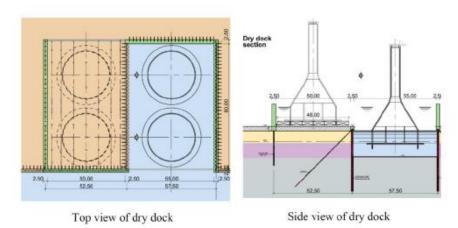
Plan and side elevation view of launch methodology for low volume production of concrete WECs from a dry dock.
